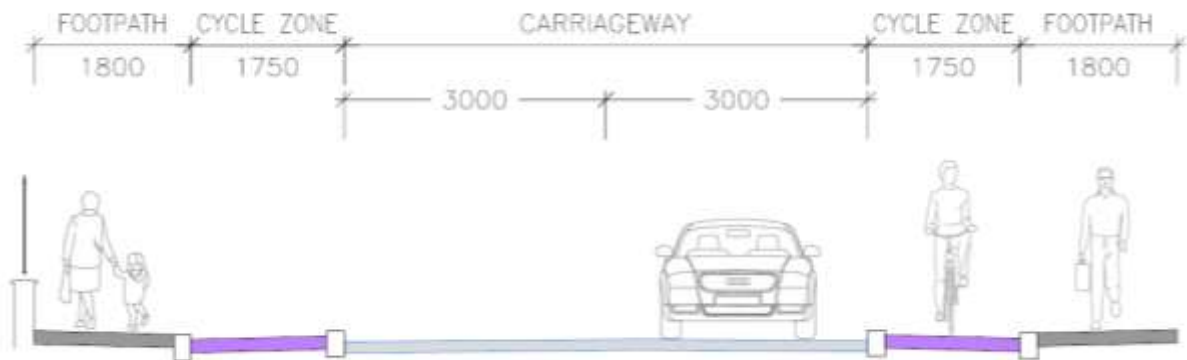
Typical Cross Section showing proposed footpath, cycle and road carriageway arrangement.
